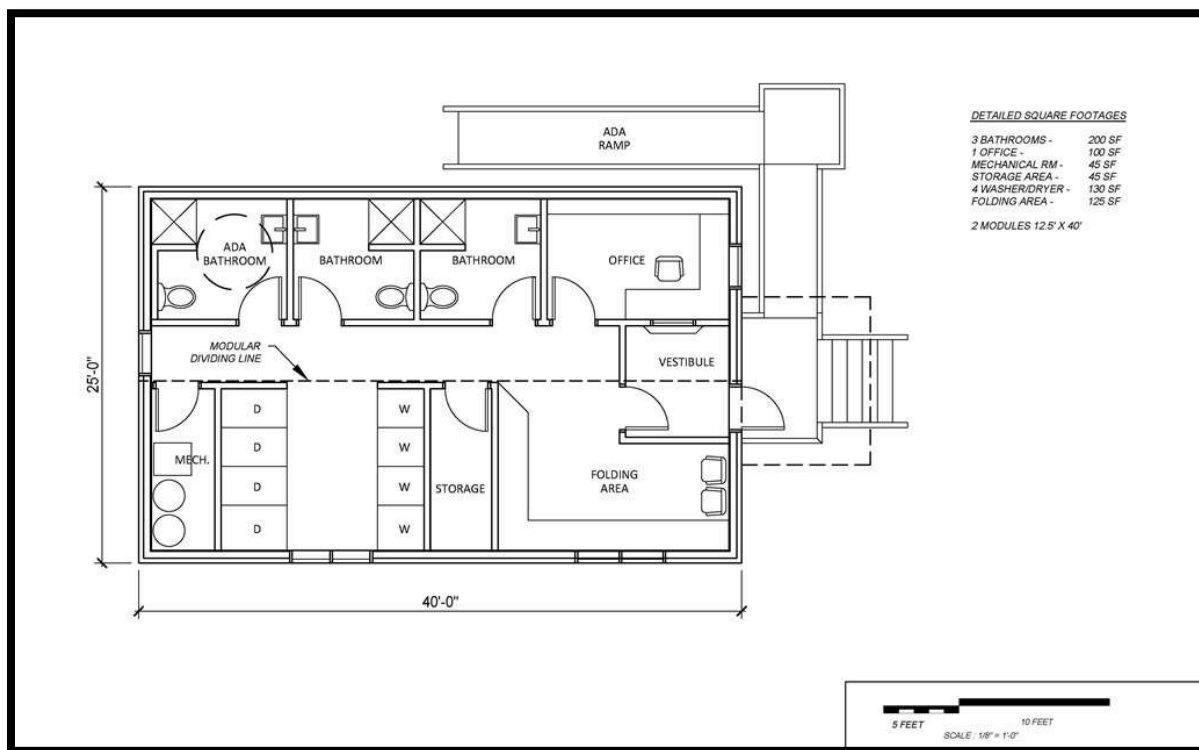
Alternative 2-New Modular Washeteria Layout
